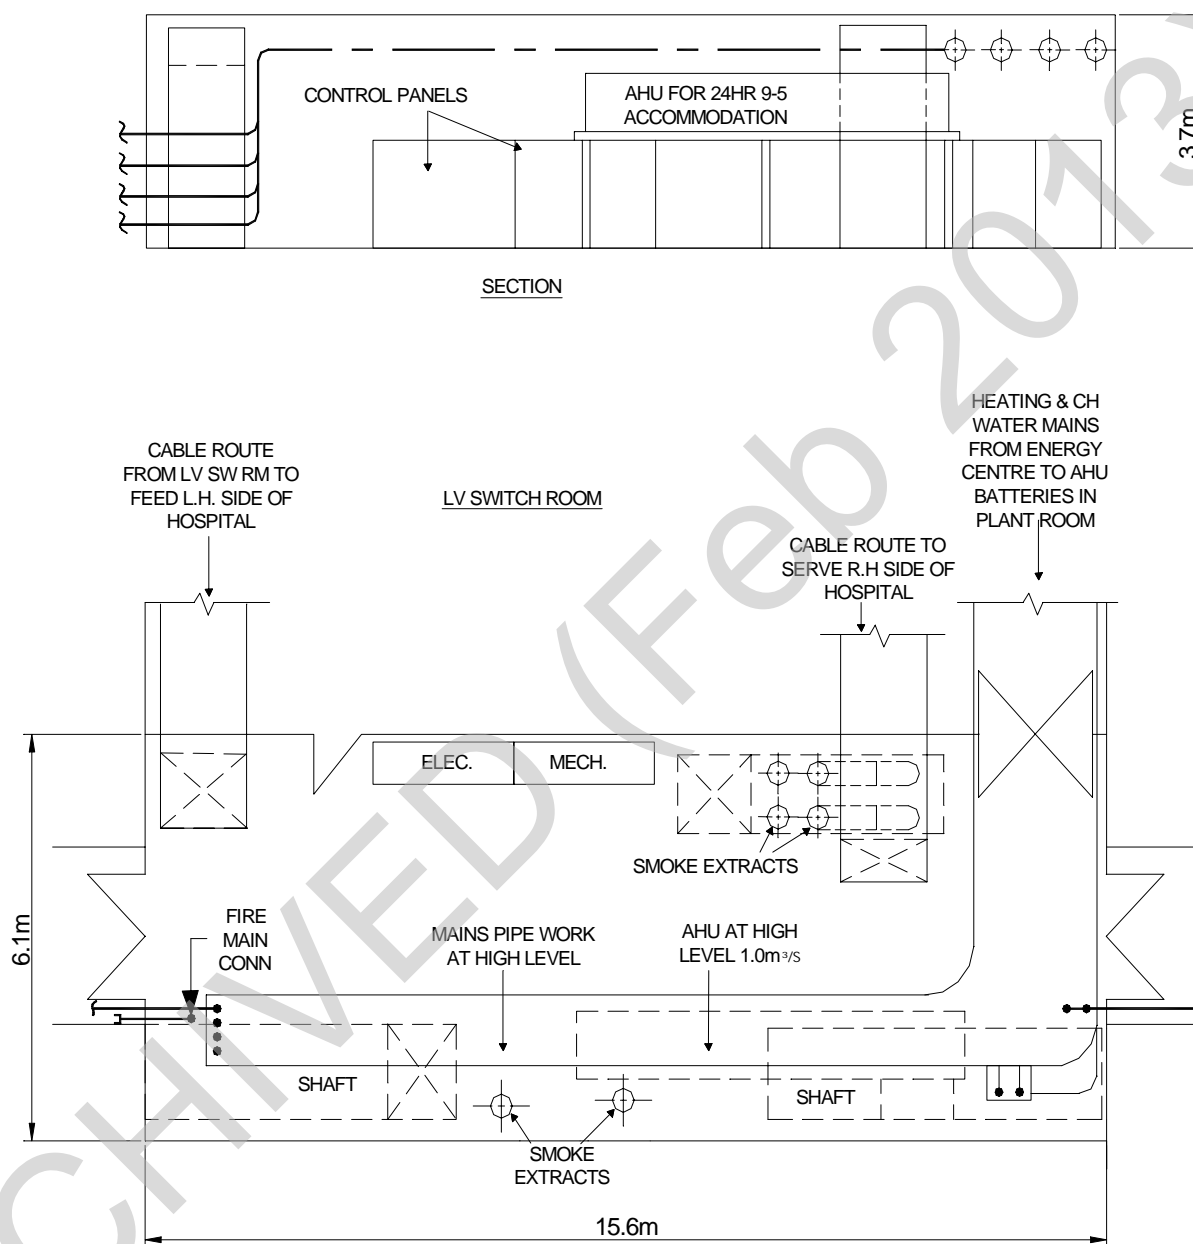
Typical plantroom 5 serving a combination of 24 hr and 9-5 accommodation departments
